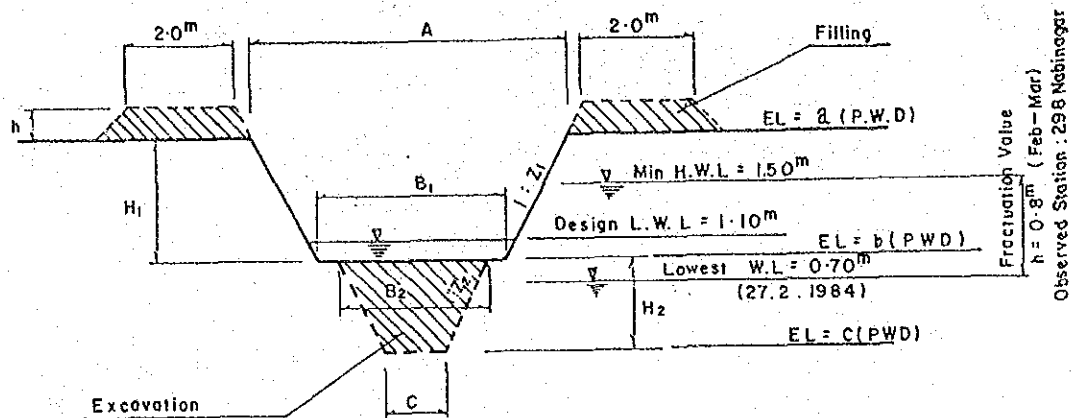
Development Plan for Irrigation and Drainage (3/3)
